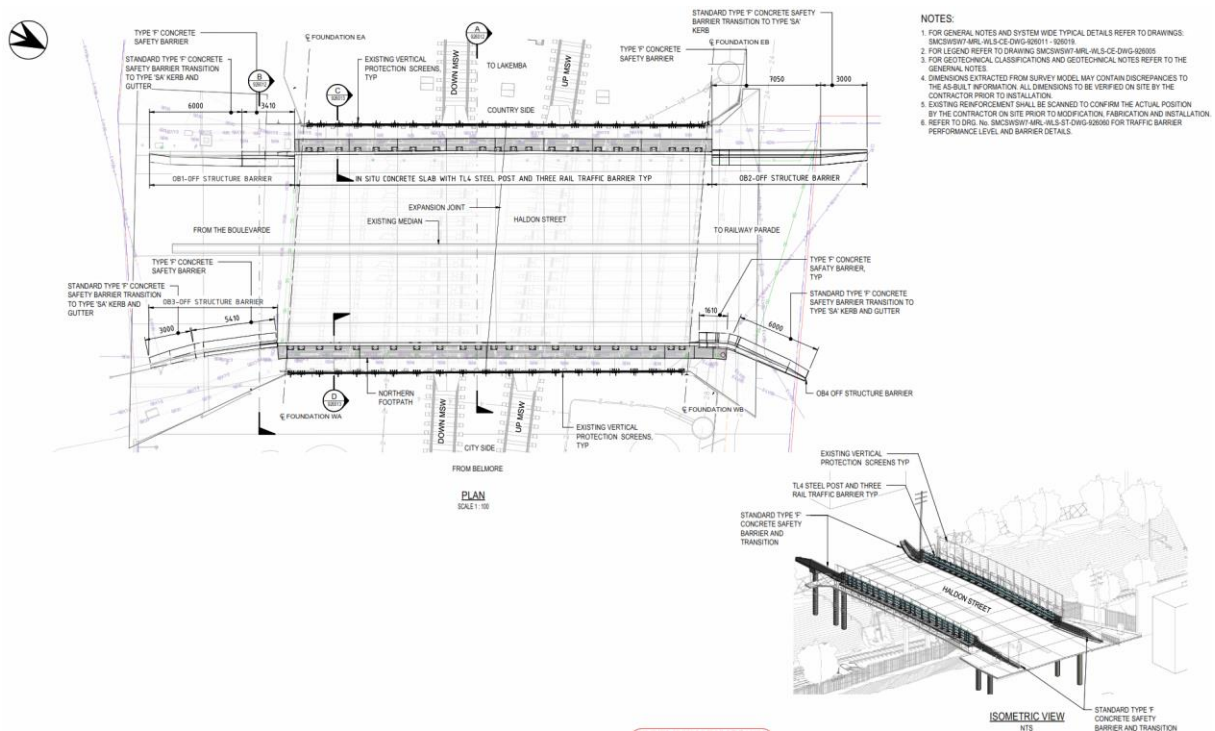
Plan of treatment works for Haldon Street Bridge (Source: Metron T2M 2022, provided by ARCH Artifex)
